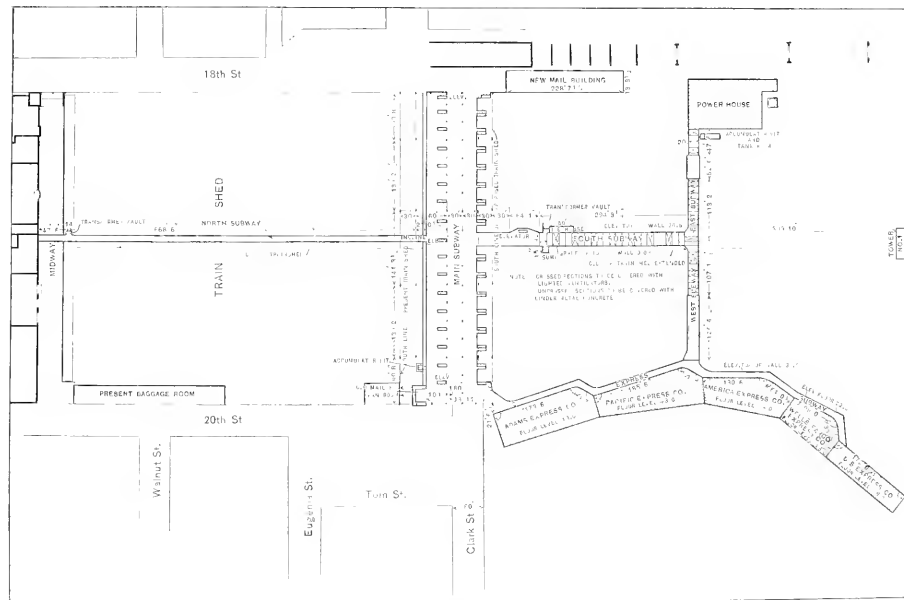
GENERAL LAYOUT OF SUBWAYS, UNION STATION. JULY, 1903.
